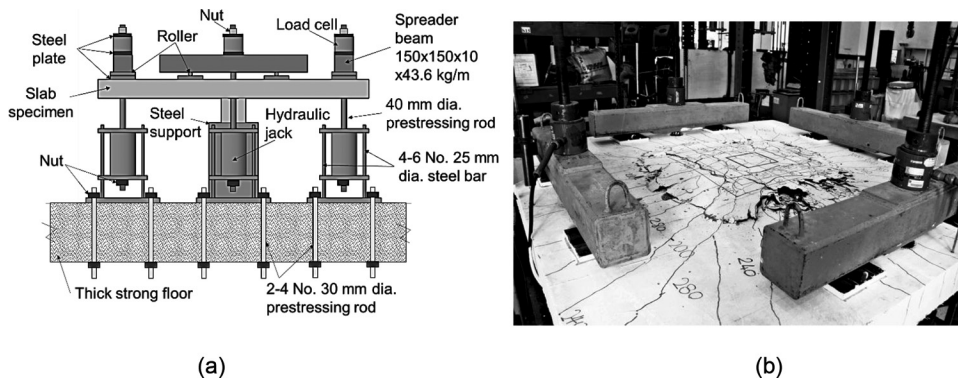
(a) Typical test setup; and (b) photograph of Specimen F09-06 after test. (Note: 1 mm = 0.0394 in.; 1 kg/m = 0.67 lb/ft.)
